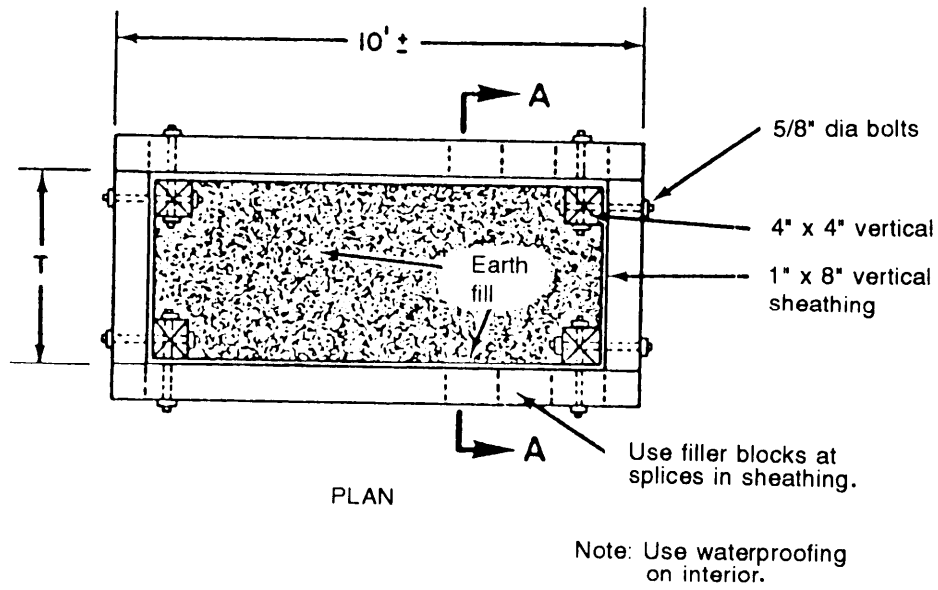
Prefabricated, dimensioned-timber crib used as a bulkhead revetment
